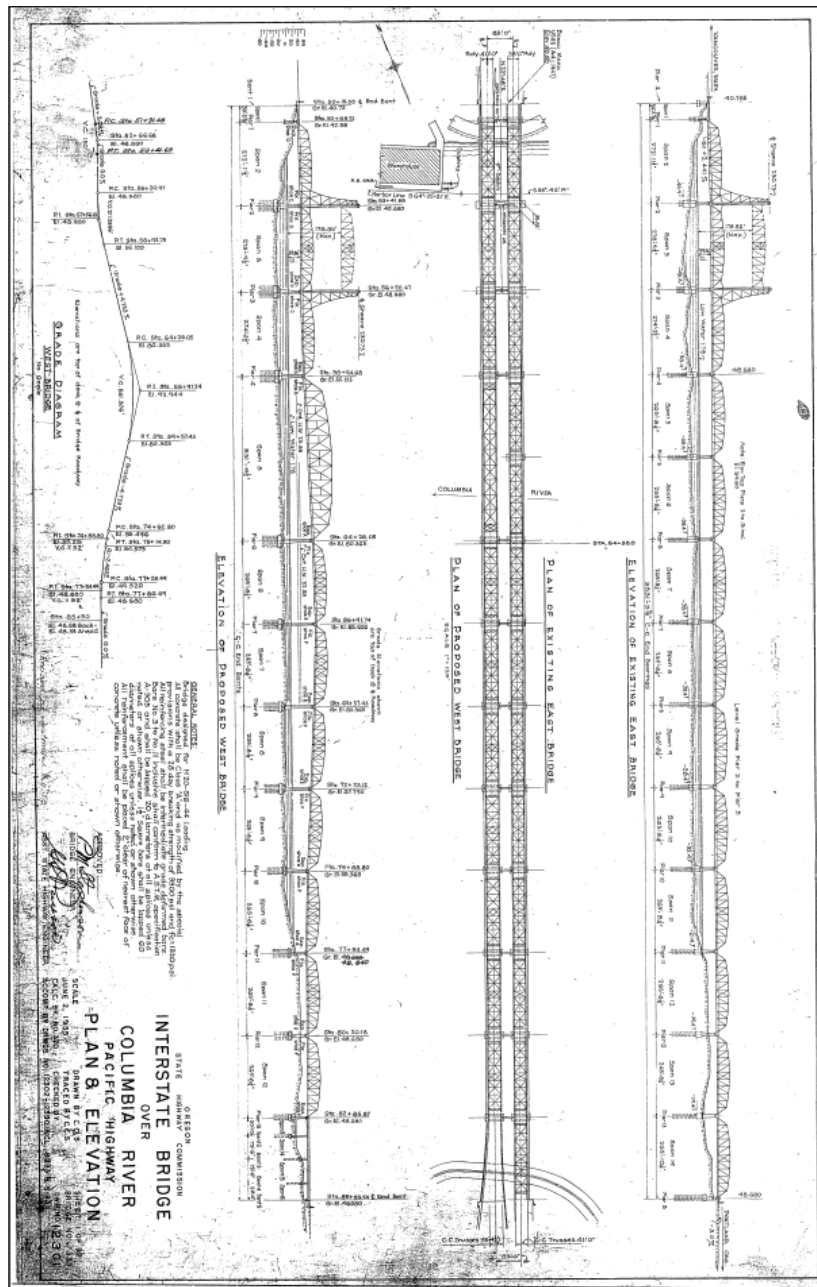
Plan and Elevation, Interstate Bridge over Columbia River, Pacific Highway, June 2, 1955 (ODOT and WSDOT).
